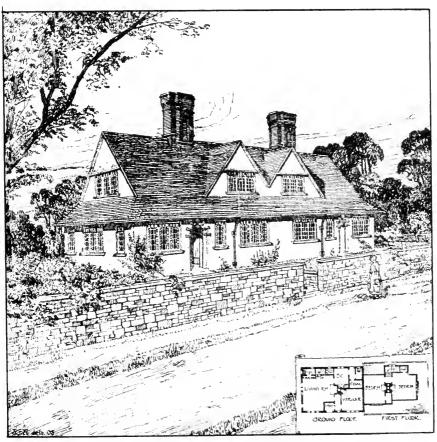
Roofing being cheaper than walling, the upper portion of this cottage is entirely in the roor. A large living-room, variour, scullery, and the usual offices are provided on the ground floor, and upstairs there are two good bedrooms with cupboards. Materials: Brick chimneys, brick and roughcast walls, and a tiled roof. Cost: £210 each house.
